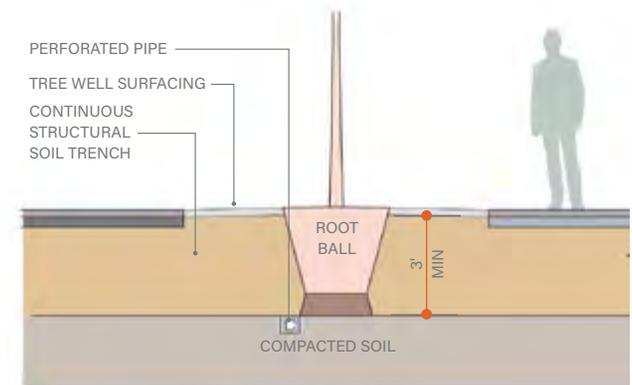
Typical Section of Sand-Based Structural Soil
